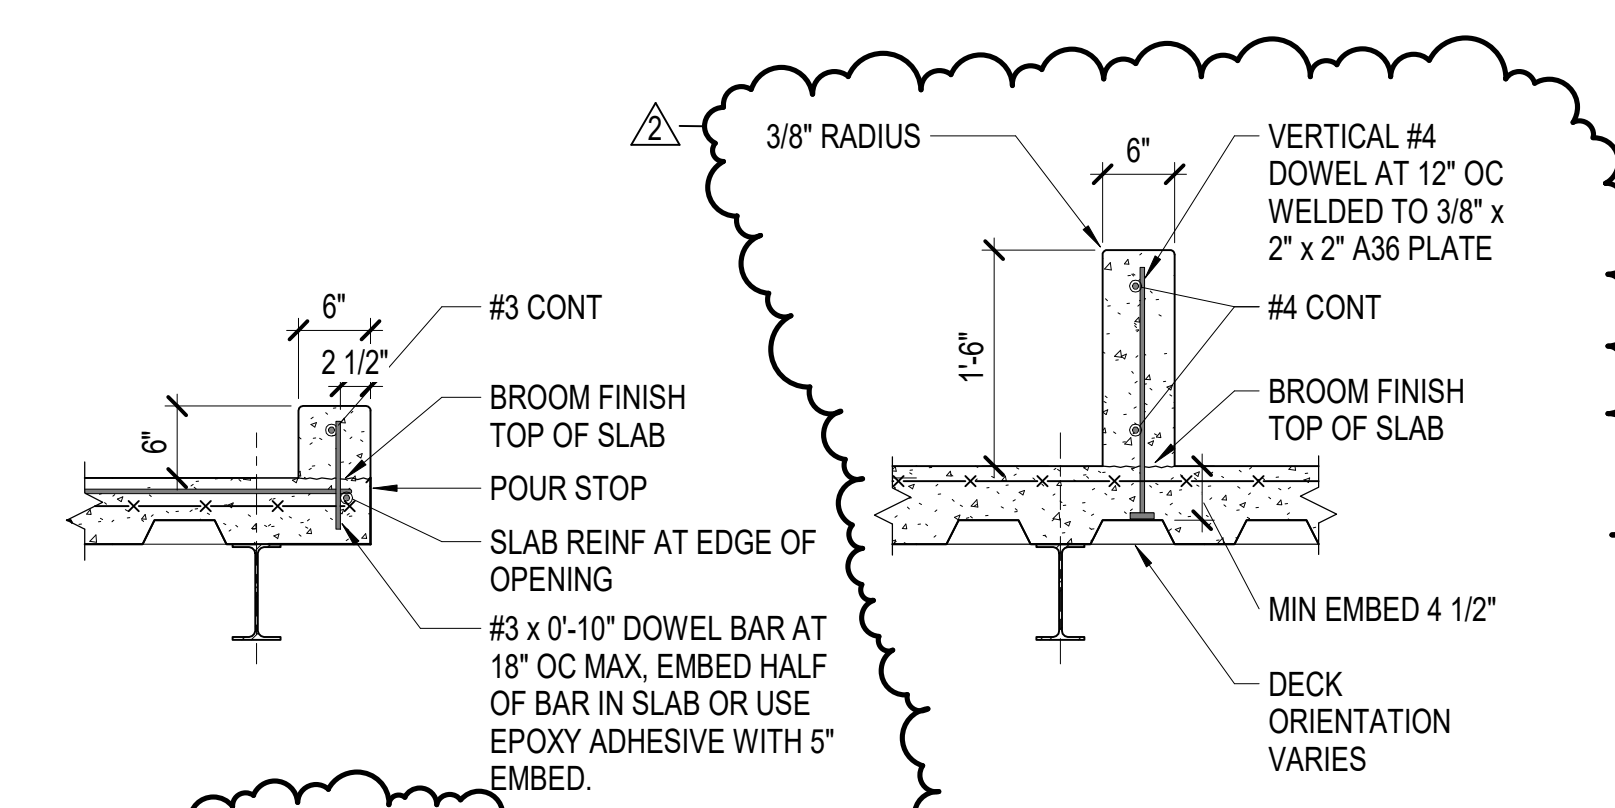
DETAIL - LIFE SAFETY POST ANCHORAGE TO STRUCTURAL STEEL
